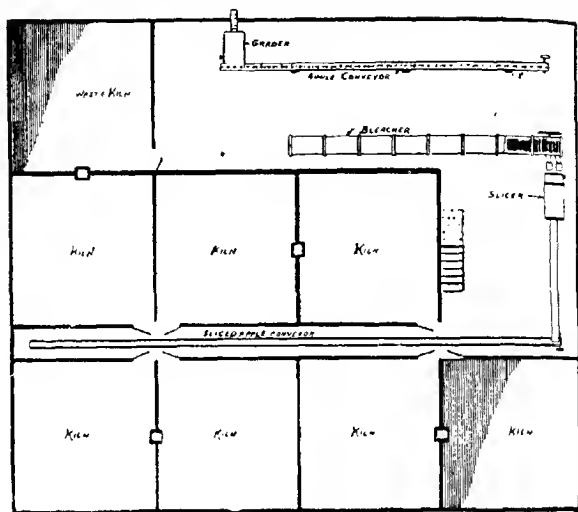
Fig. XIII.—First-floor Plan, Eight-kiln Evaporator.
